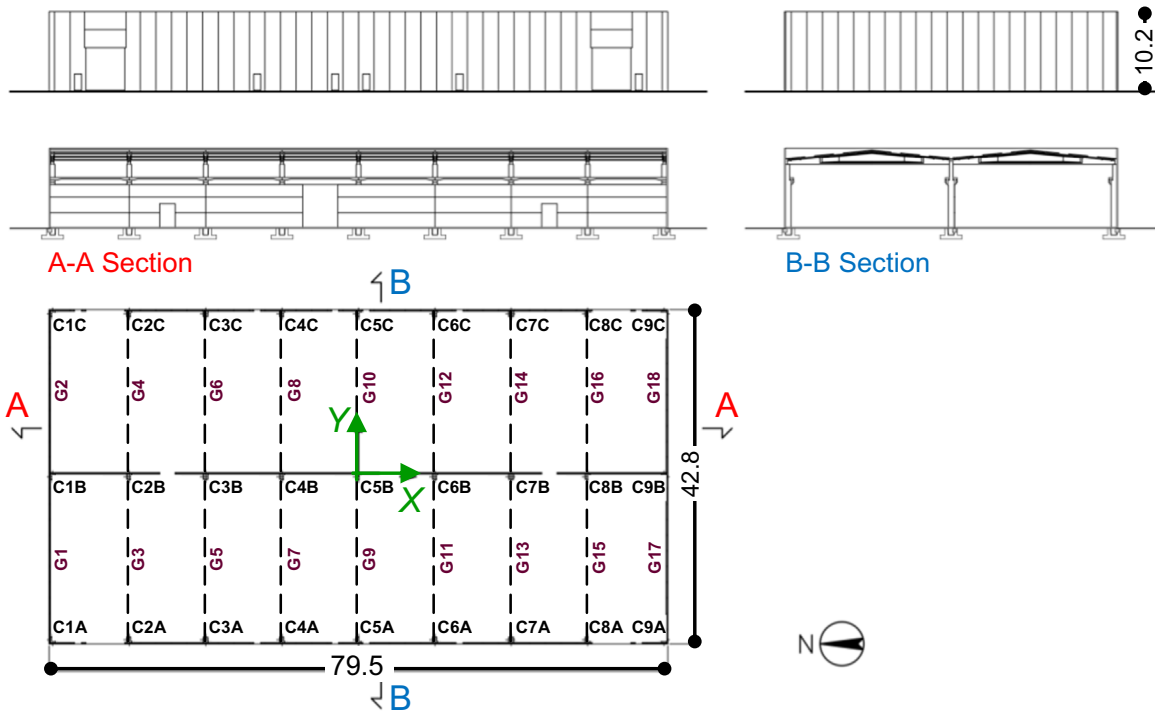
Main and side façades, sections and plan (dimensions in meters) of the building.
